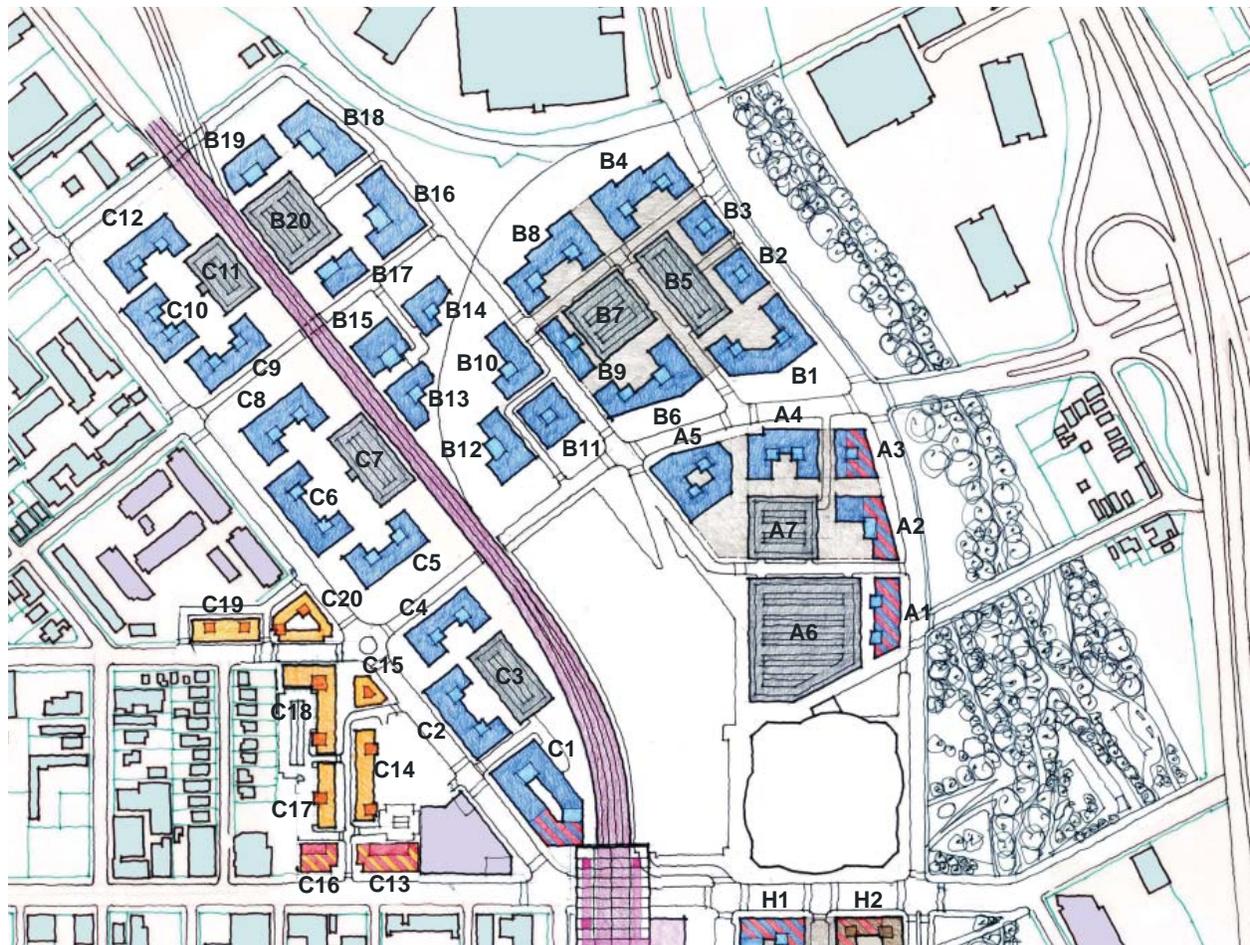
TEST-FIT PLAN - BUILDINGS AND USES - NORTHERN ZONE
